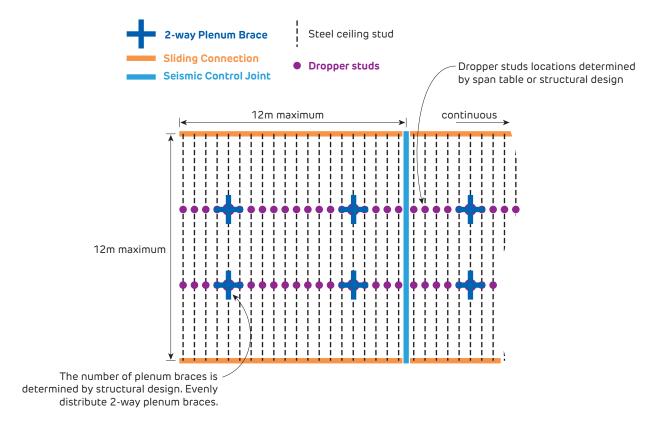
Stud Ceiling Type C1 - 2-way Plenum Braced Plan
